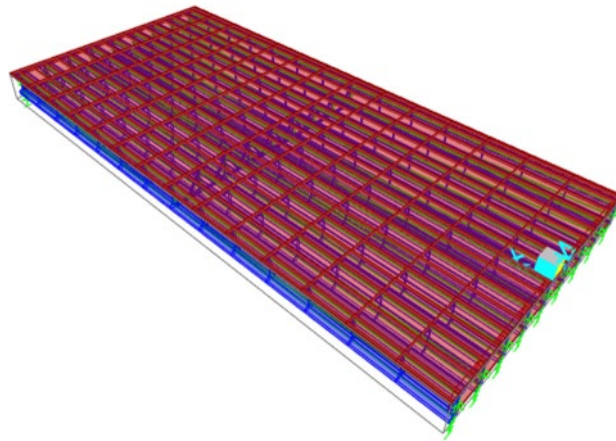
Model. CSIBridge model of Span 14 of Bridge11B of the I-16 I-75 Interchange project with prestressed girders
